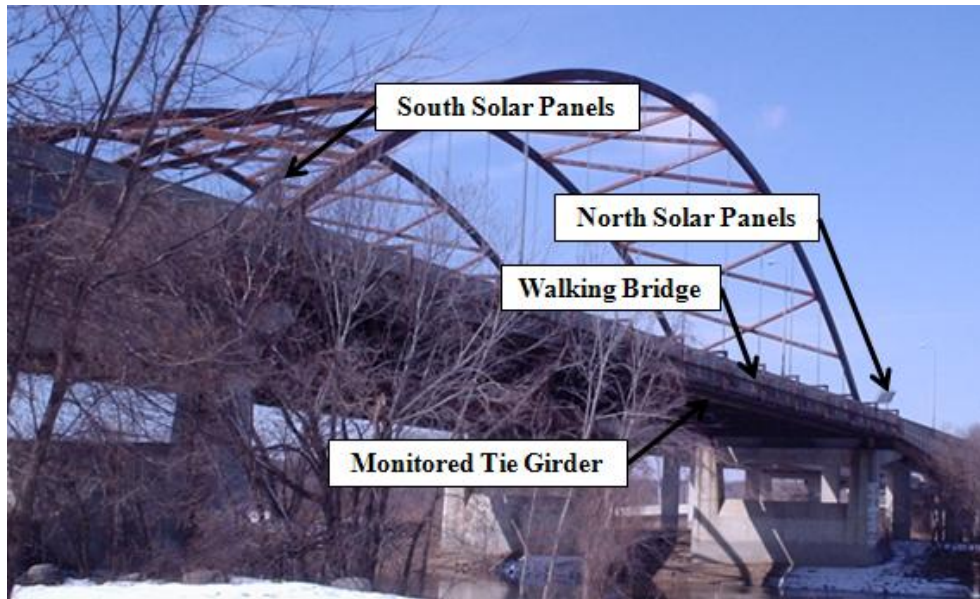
Walking bridge adjacent to monitored tie girder photo
